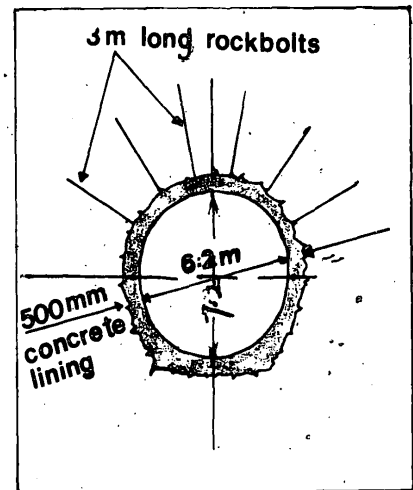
(ii) CROSS SECTION THROUGH POWER TUNNEL
